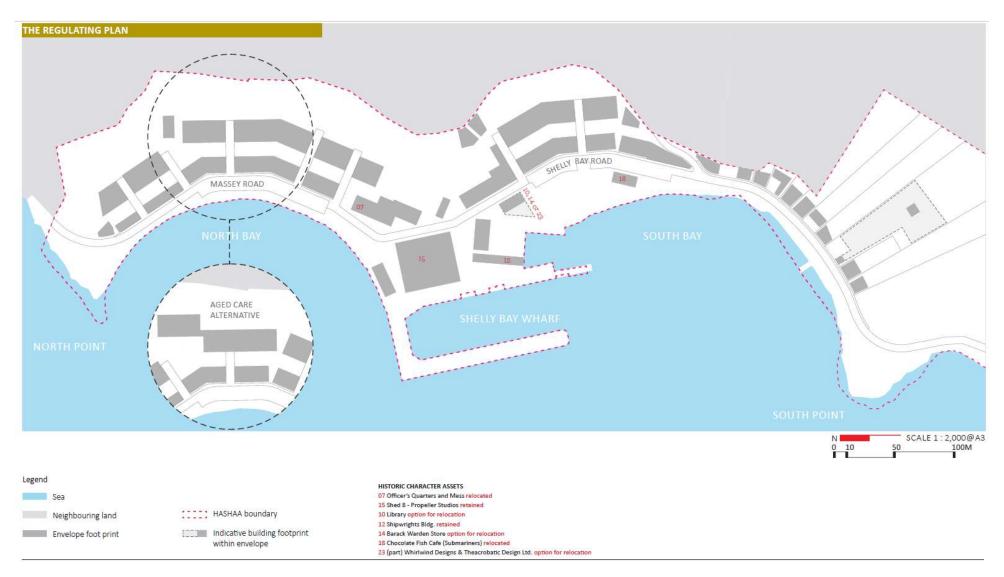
Regulating plan for Shelly Bay as proposed in the 2019 Masterplan (p16)
